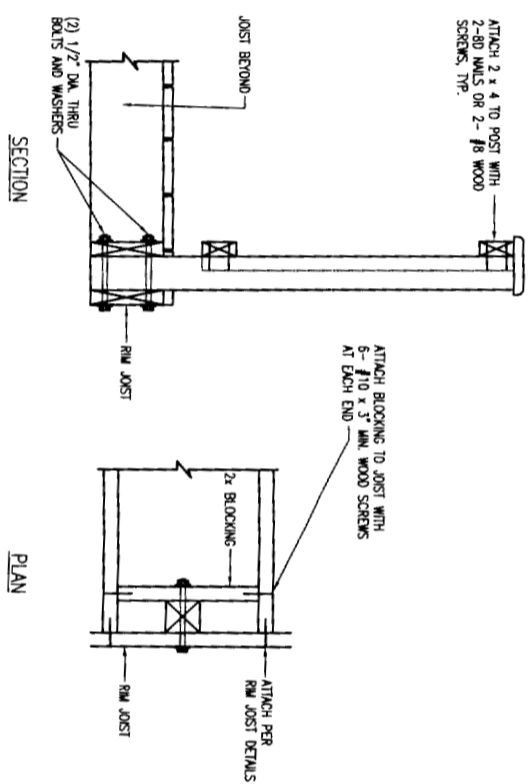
GUARD POST TO RIM JOIST DETAIL - OPTION 1
